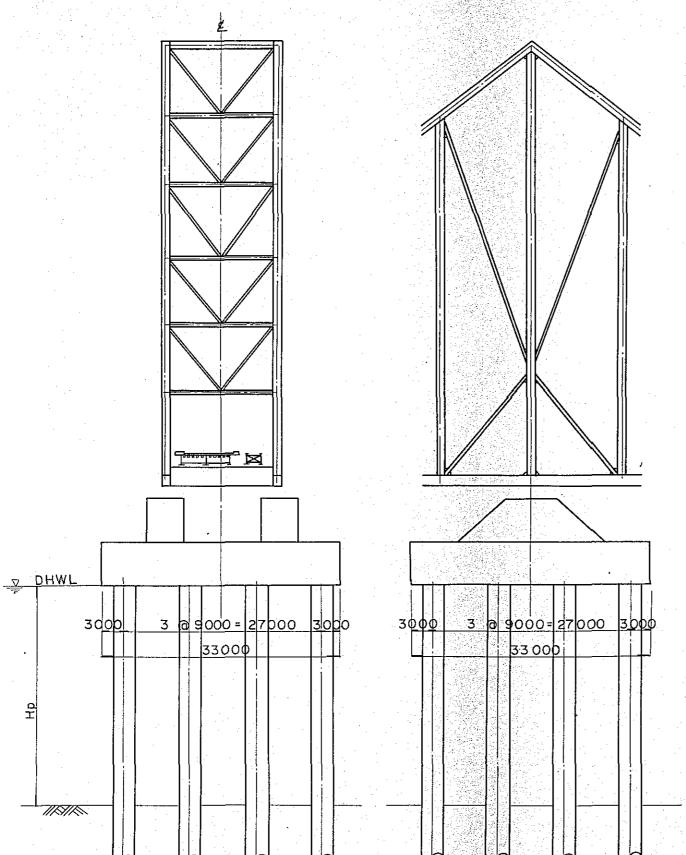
|2 Outline of structure of multi-pile-foundation ø 3.0 m
